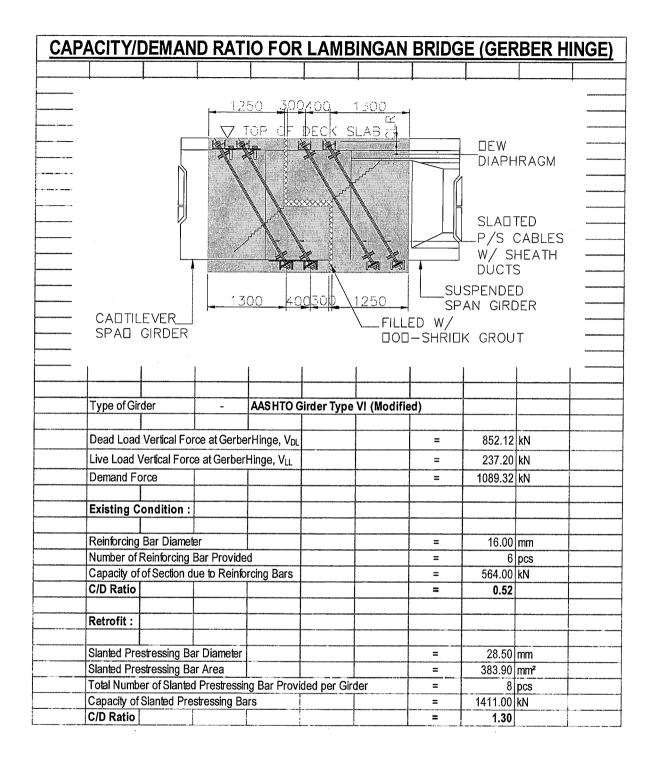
DETAILS OF REHABILITATION (LAMBINGAN BRIDGE)
